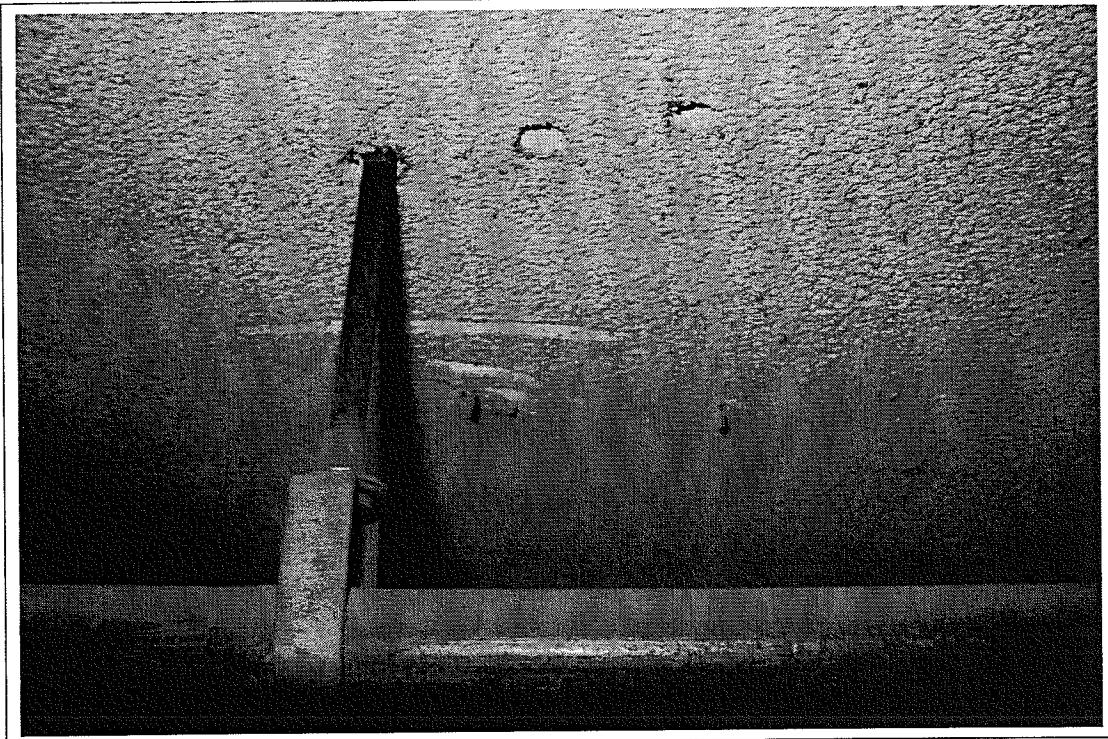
Impact damage and hanger rod holes in fireproofing applied to concrete deck channels above West Baggage Handling area (FS2)
